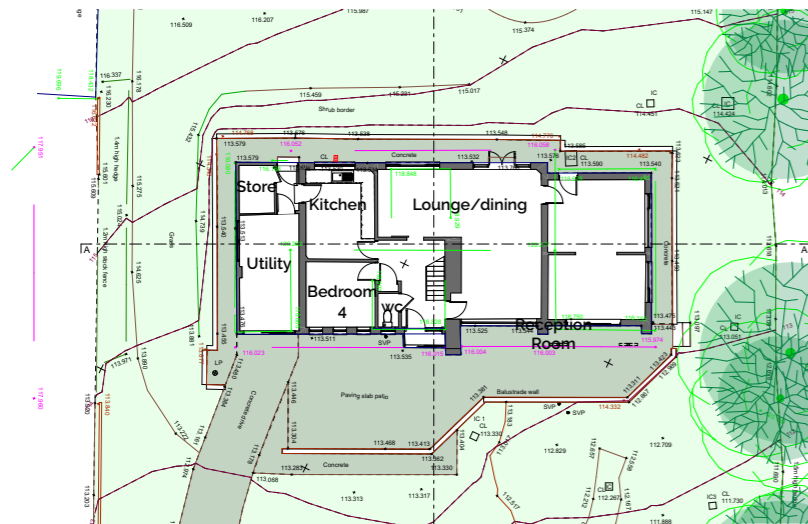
71 Leeson Road Existing Ground Floor Plan - Not to Scale
